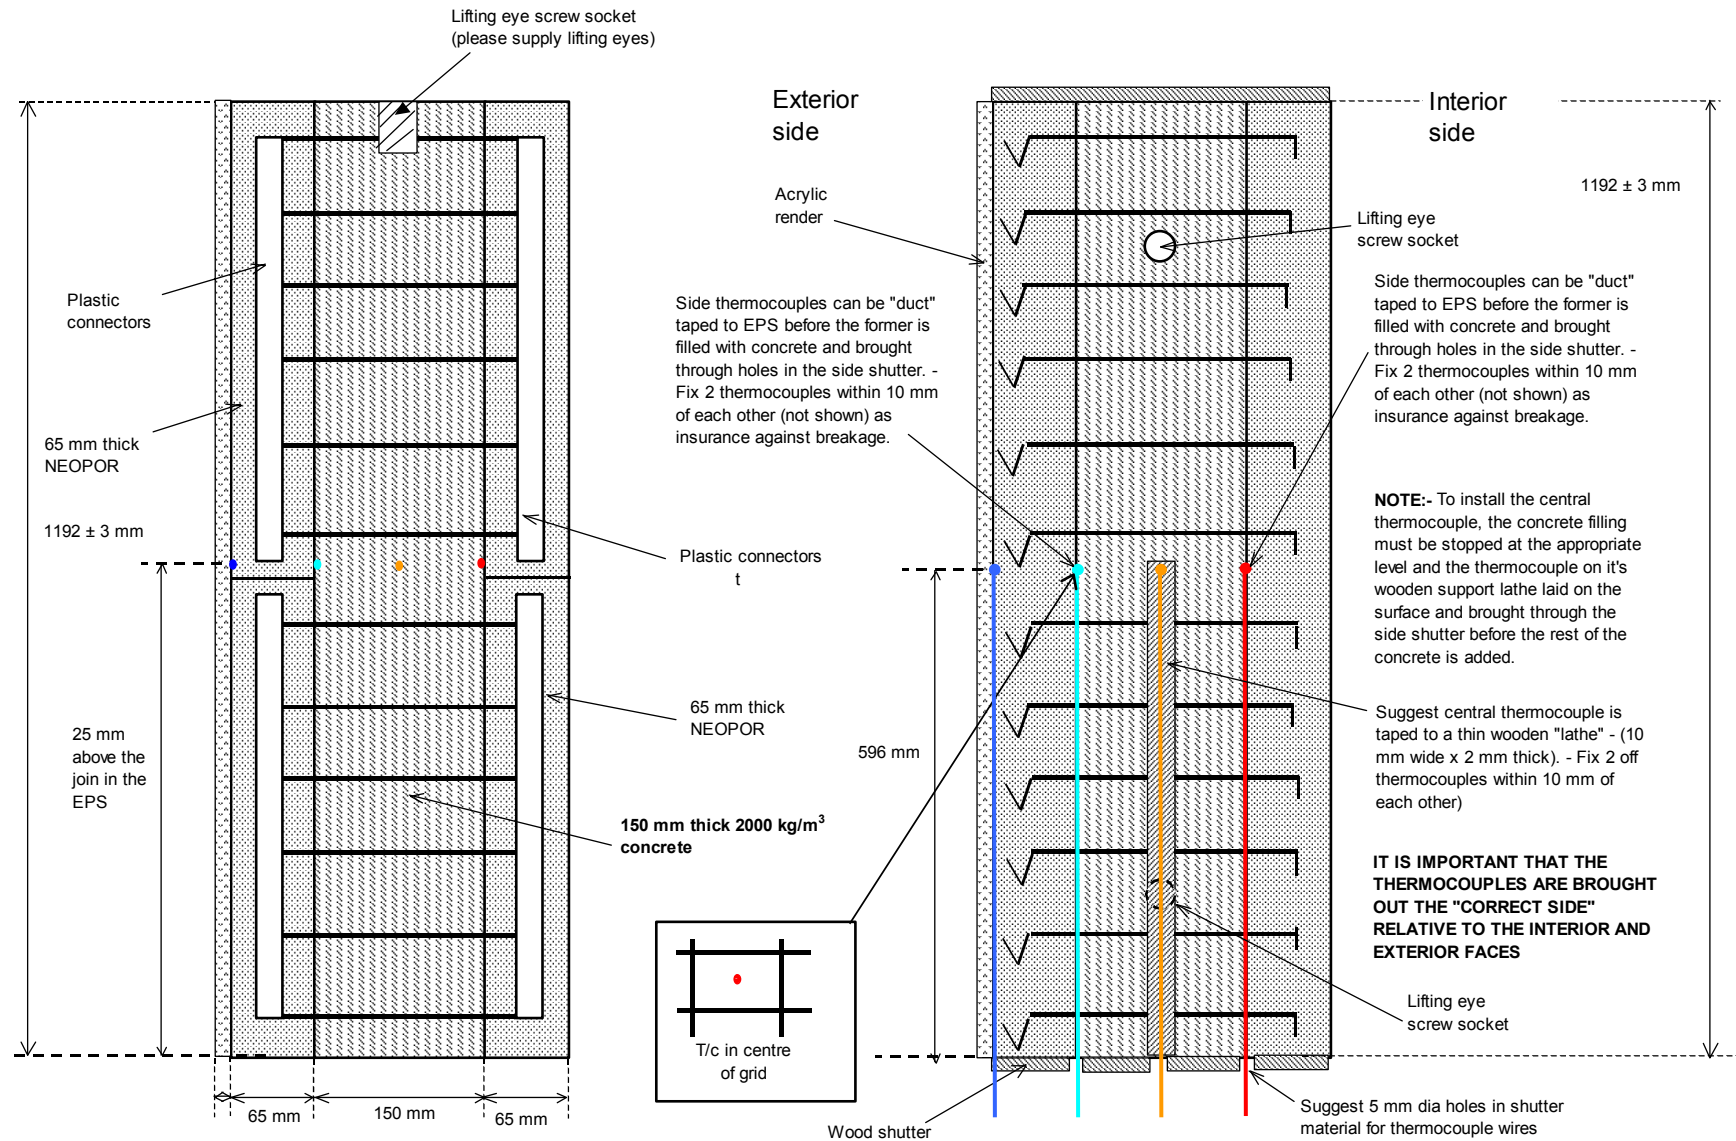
Drawing of Wall 4 - ICF wall with Neopor and steel connectors
